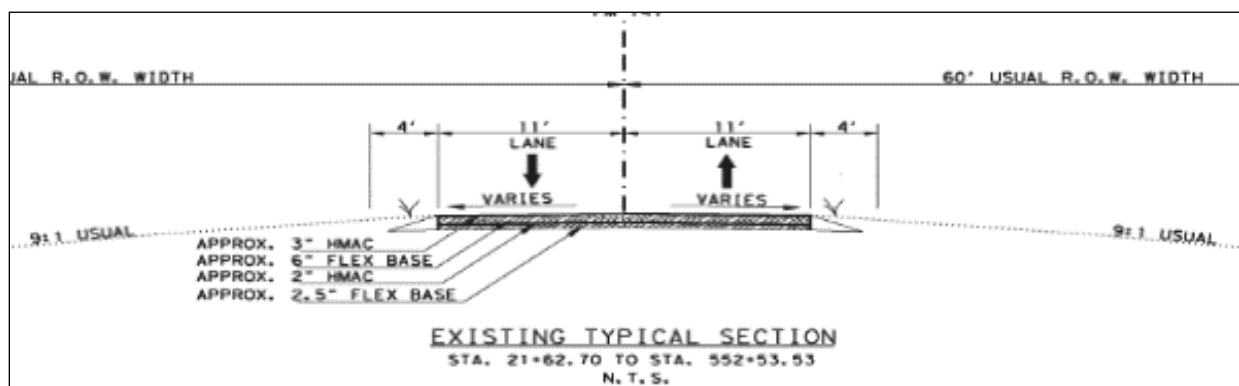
Pre-Construction Existing Typical Section, Project 4.
